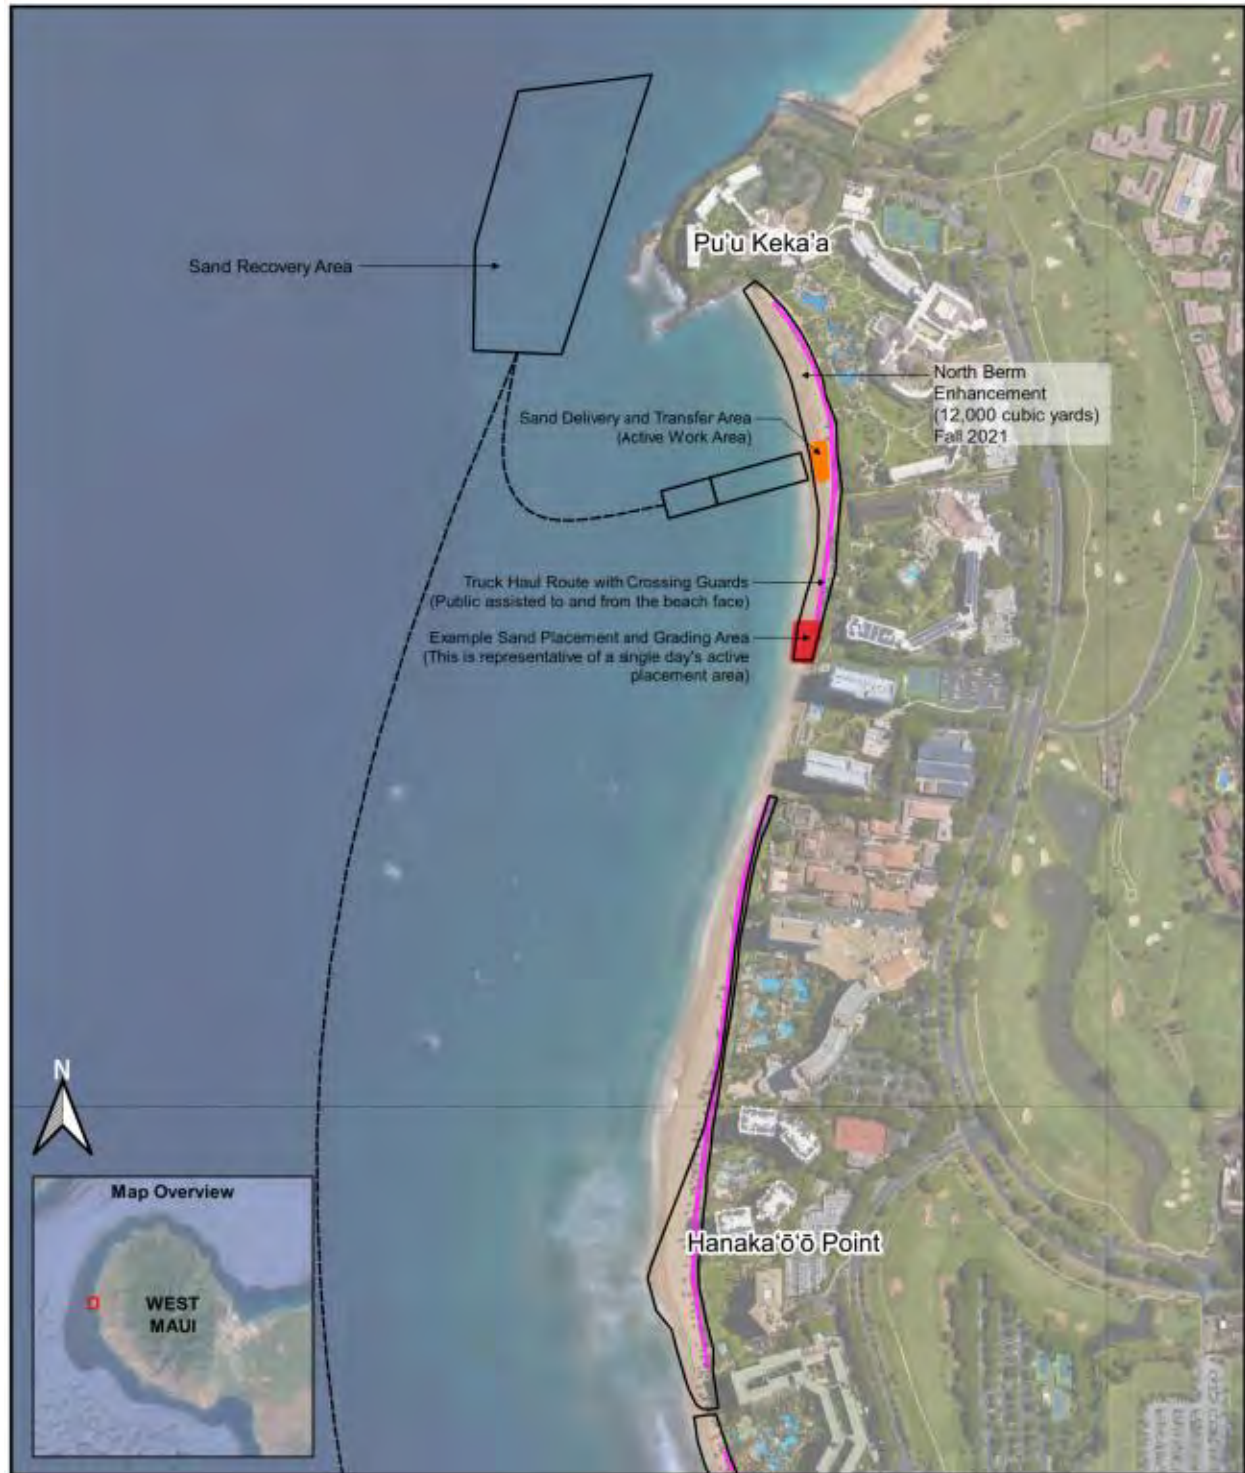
North Berm Enhancement sand transfer, truck haul route, and typical daily work area.
